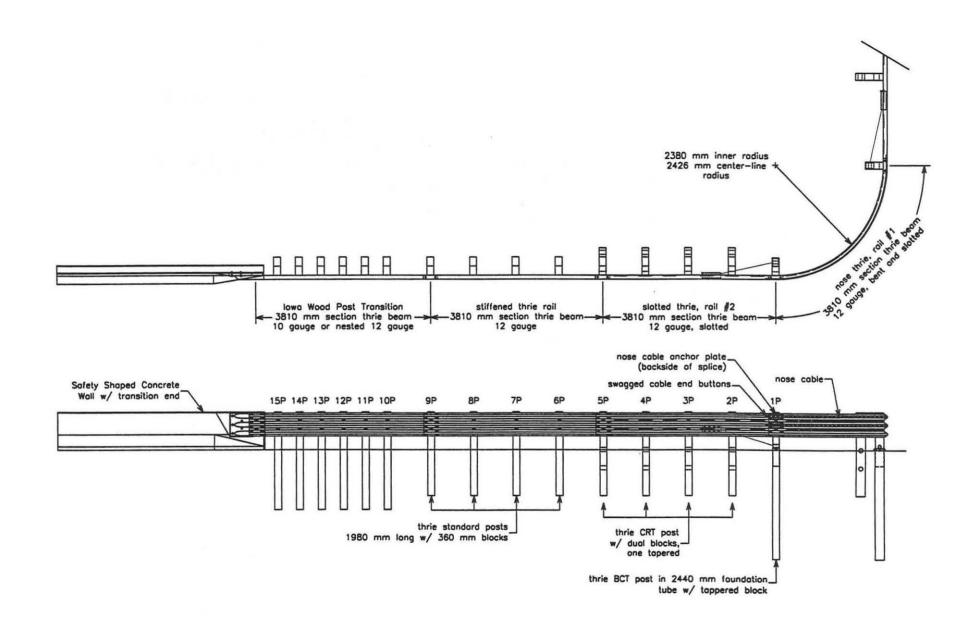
Short-Radius Design Concept, Bridge Transition Side View
